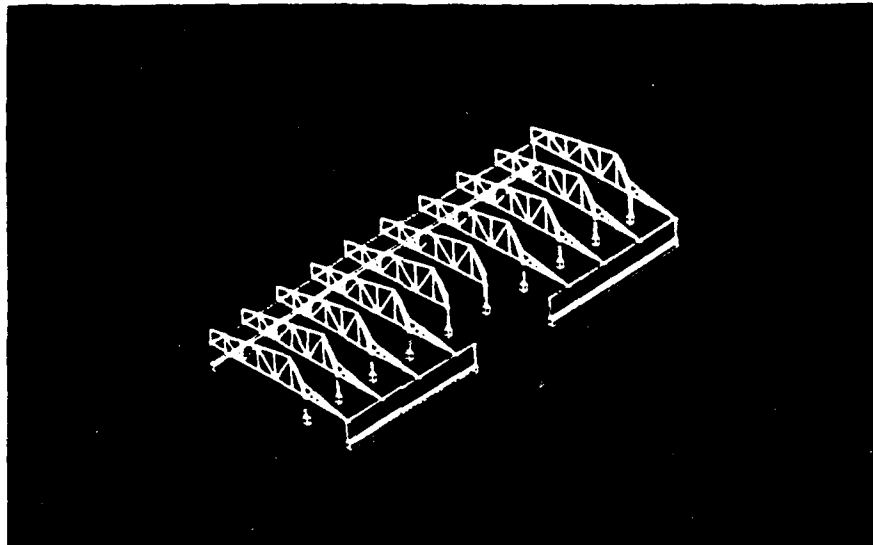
Footings, foundations, columns, and girders are sketched and extruded. Presently, sizing and layout are calculated outside CAEADS. Eventually, an automated interface will be provided.
